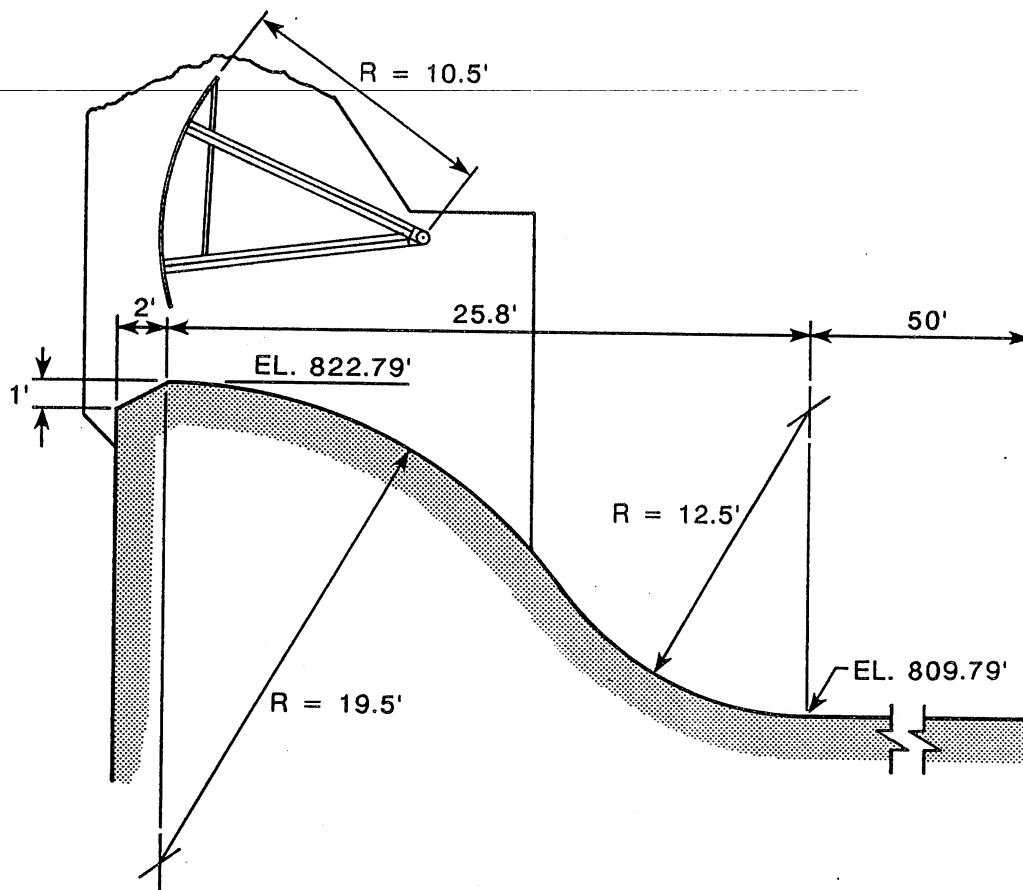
Cross section of tainter gate spillway bay 1-12, left bank.
